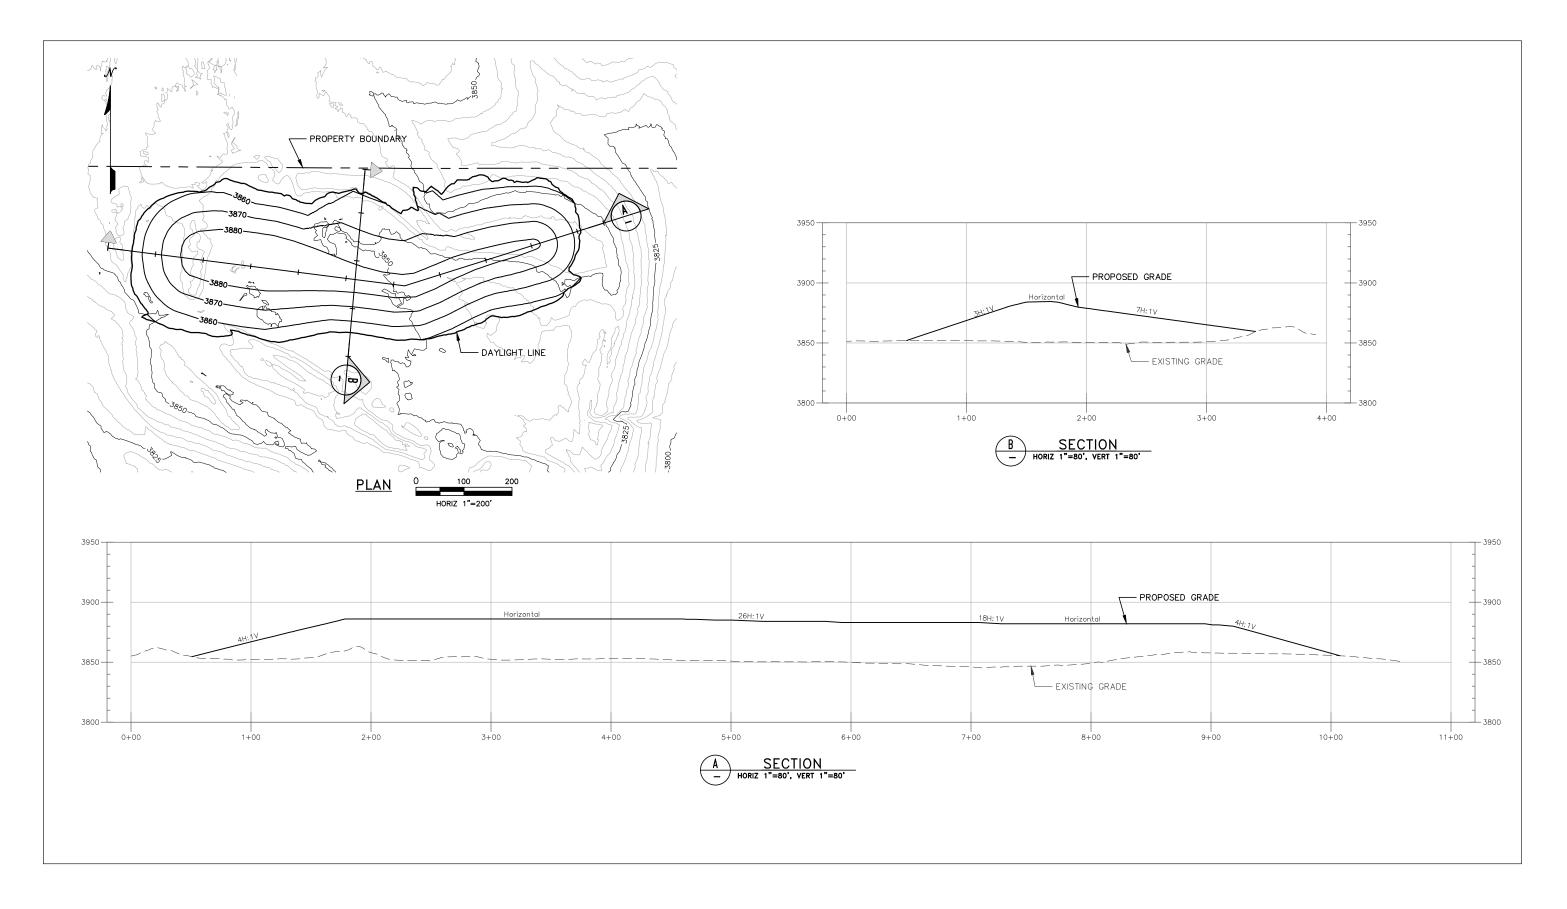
J.C. Boyle Right Abutment Disposal Site Plan & Sections
